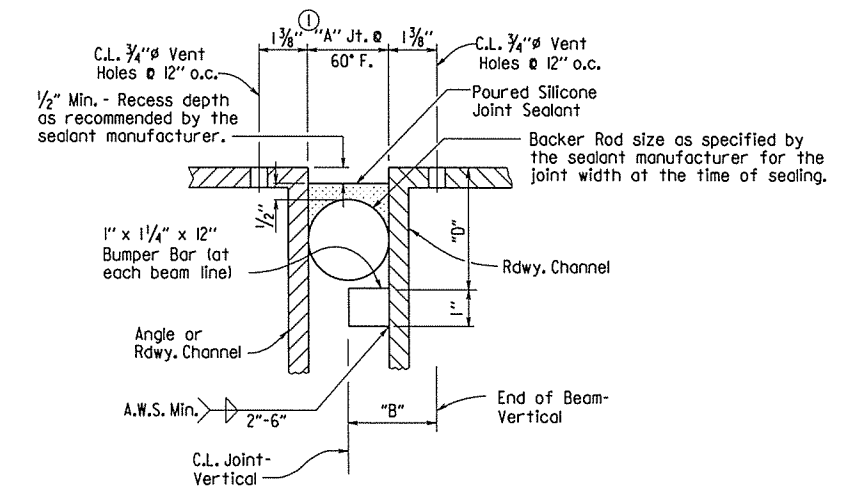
DETAILS FOR BLOCKING EXPANSION JOINT DEVICE
